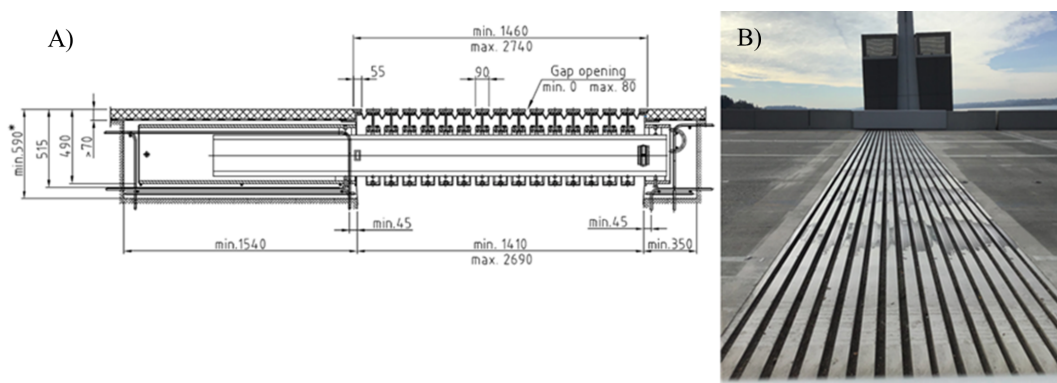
Expansion joint design. The I-beams run across the lanes to provide a continuous medium of traffic with the two sides of the bridge. (A) Engineering drawing of the expansion joint. (B) Installed expansion joint.
